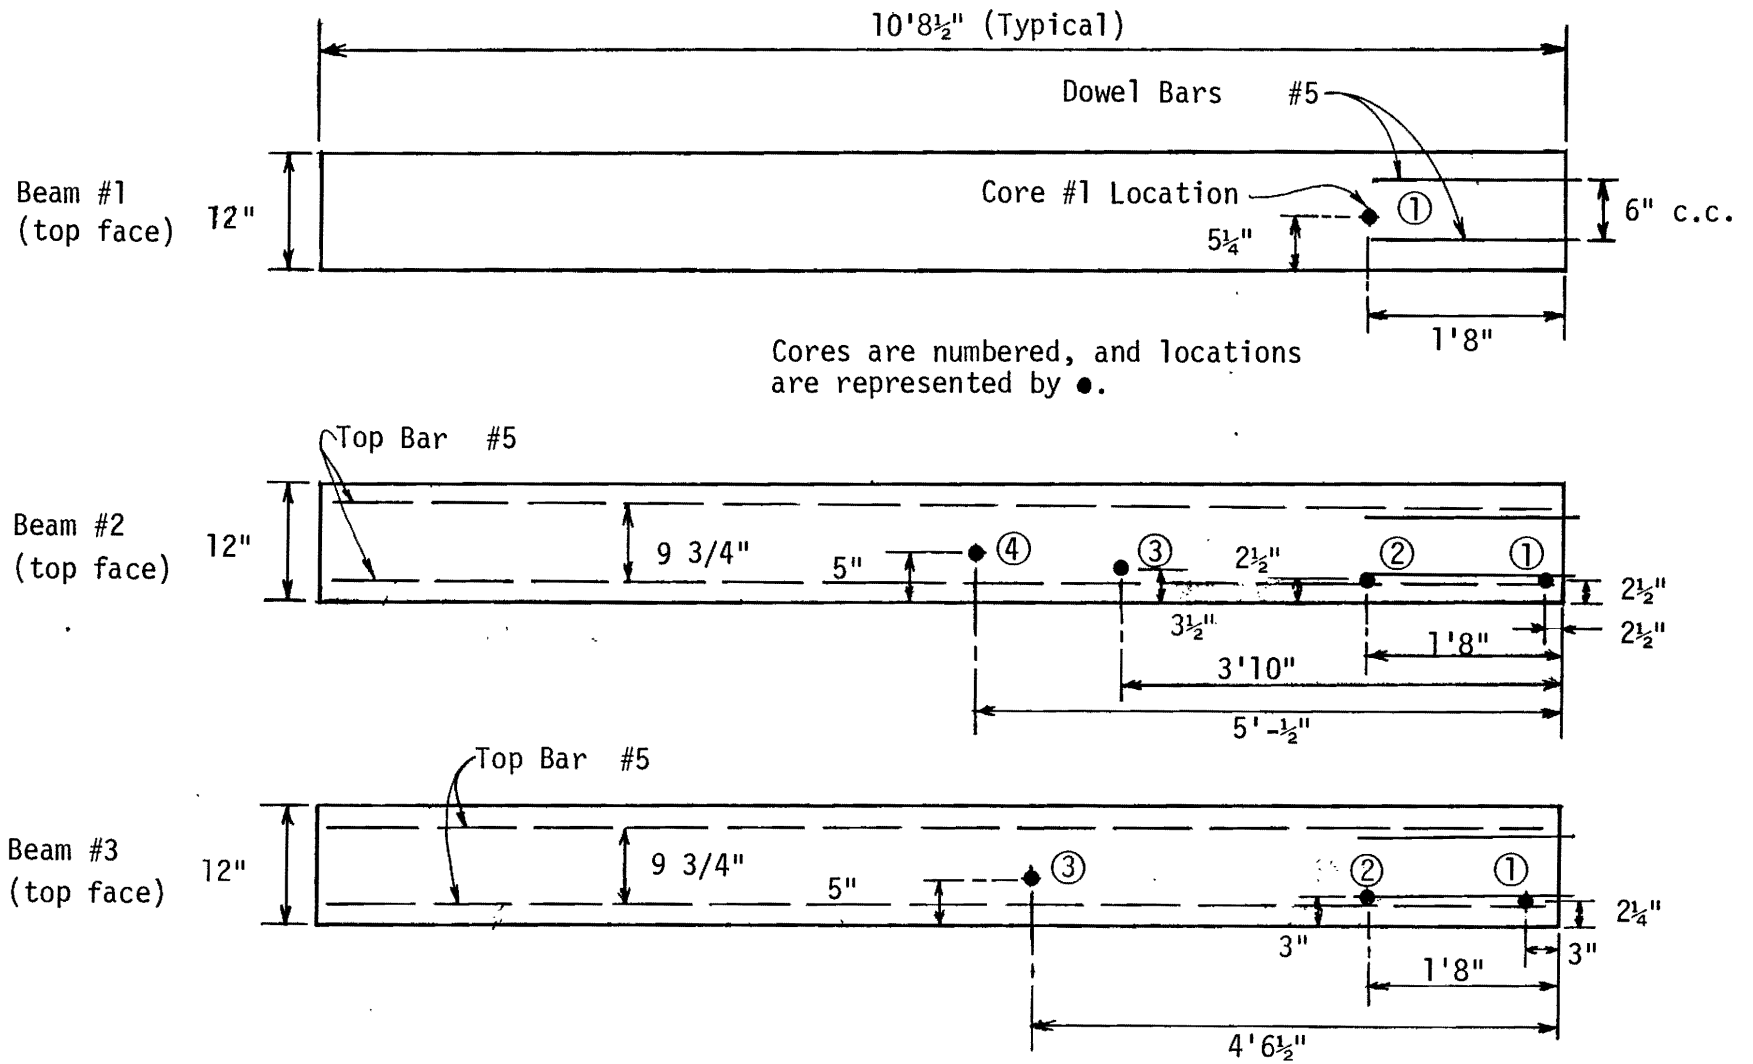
Location of Drilled Cores along Test Beams #1, #2, & #3.
